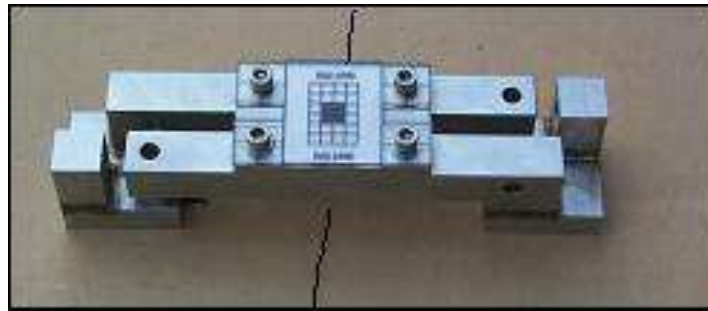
Photograph of the DWAF2001 Bi-triaxial crack gauge with assembly unit and tell-tale face.
